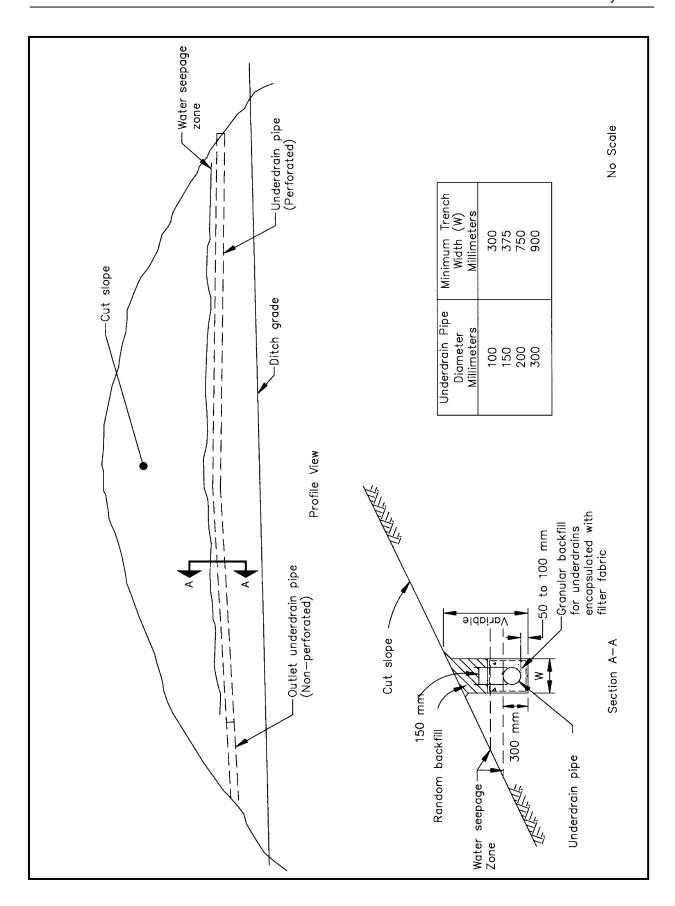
N TYPICAL UNDERDRAIN INSTALLATION FOR BACKSLOPE (Metric)
